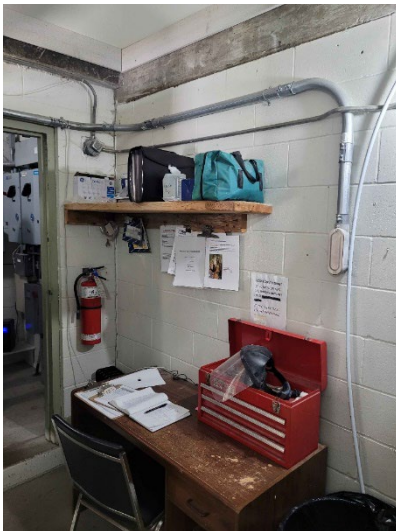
Operator desk. Note existing conduit from manual Generator Switch to outdoor connection.
